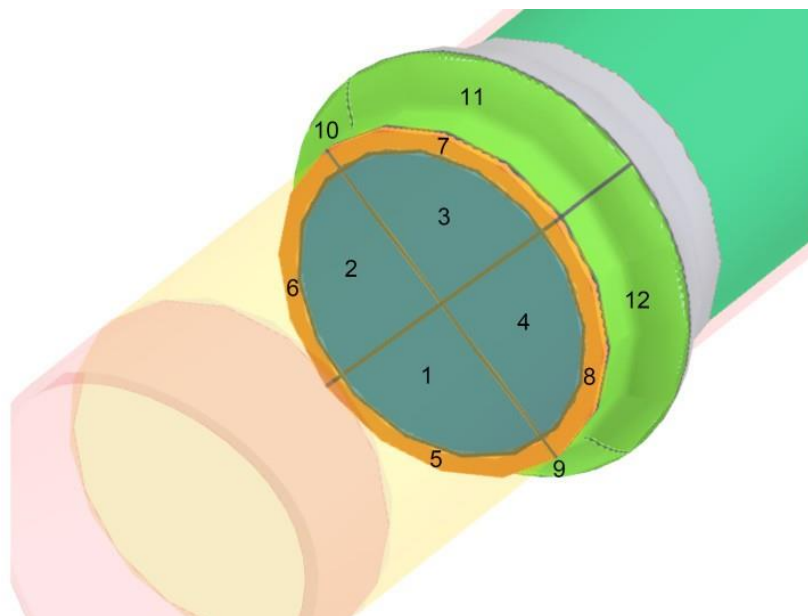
NSC: Detailed layout of the membrane at the interface with the concrete plug (zone 3)
